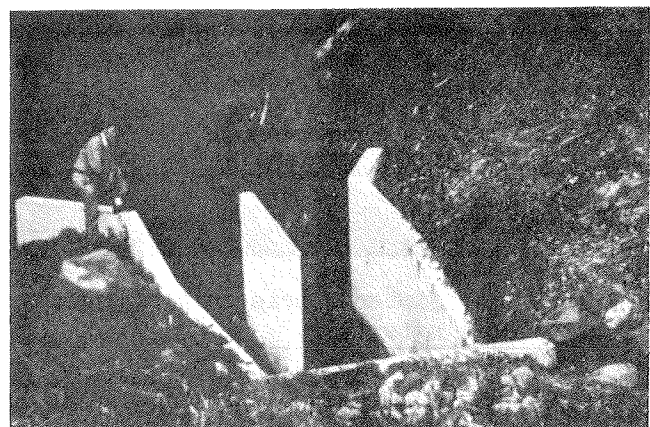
Concrete debris fin for single culvert. Preferable if more area existed between wingwalls and fin.
